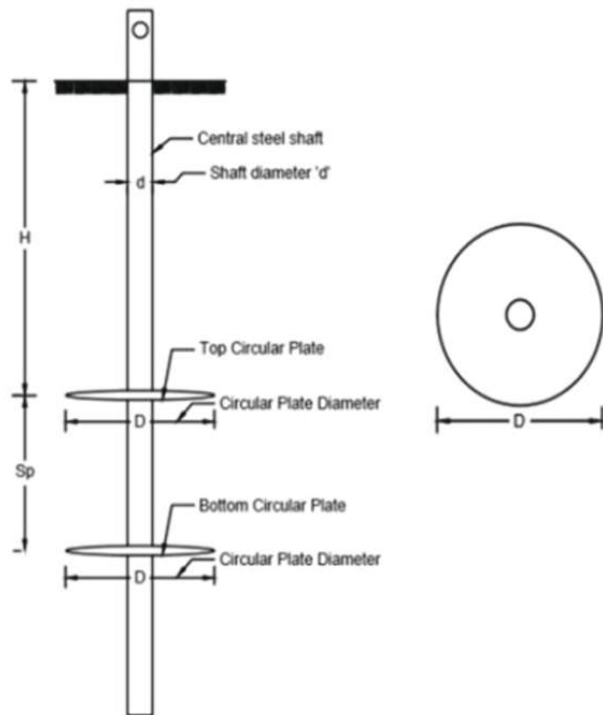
Elevation & Cross section of Circular Plate Anchor
